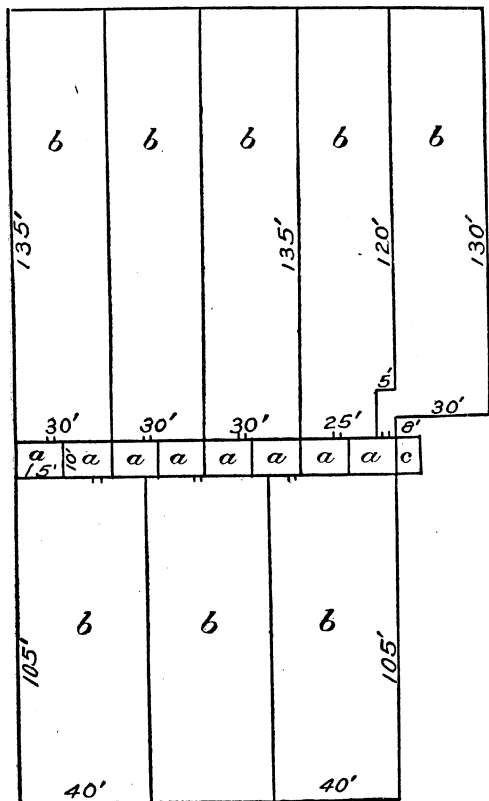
Plan of poultry building and yards: a, Compartments or pens, 10 by 15 feet, for 30 hens each. There are 8 pens and the entire building is 128 feet long. b, Yards or runs, one for each pen. Five of the yards are situated on one side of the building and three on the other; they are approximately equal in area. c, Feed room 8 by 10 feet.
